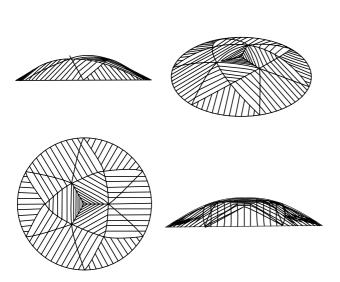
Front and side elevation, perspective view and plan of spline dome.
